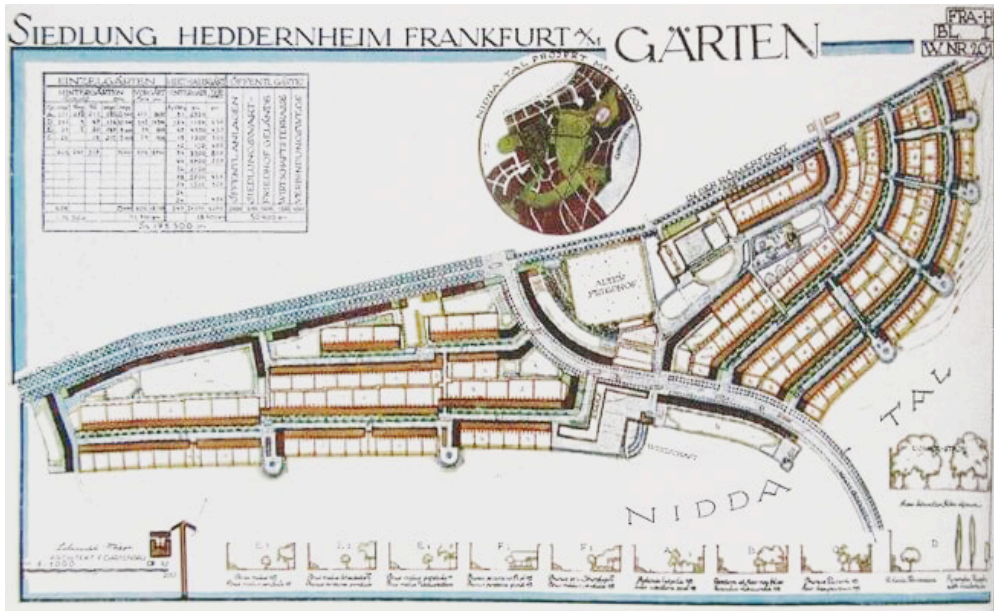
Romerstadt, plan and section, proposed by Ernst May and Leberecht Migge © ernst-may-gesellschaft.de
